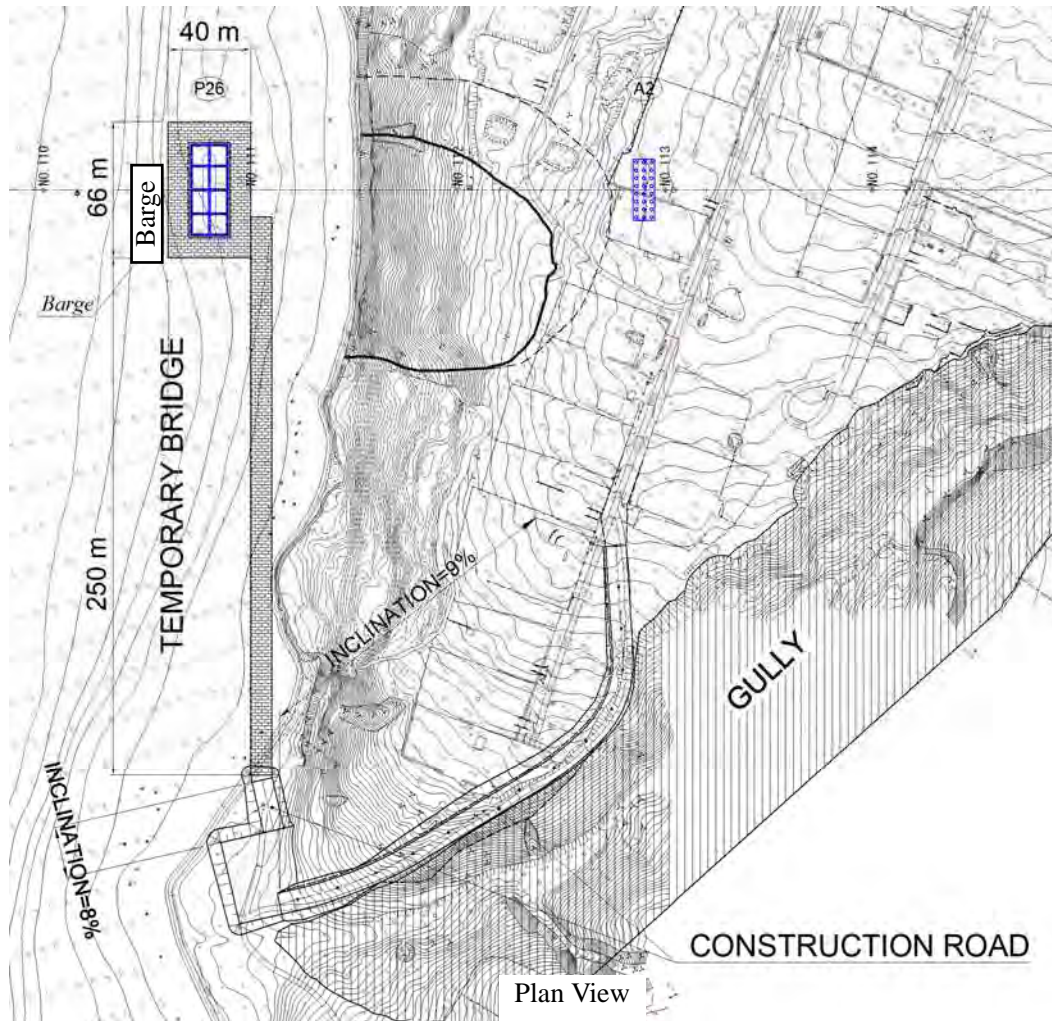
Right Bank Temporary Bridge and Construction Road
